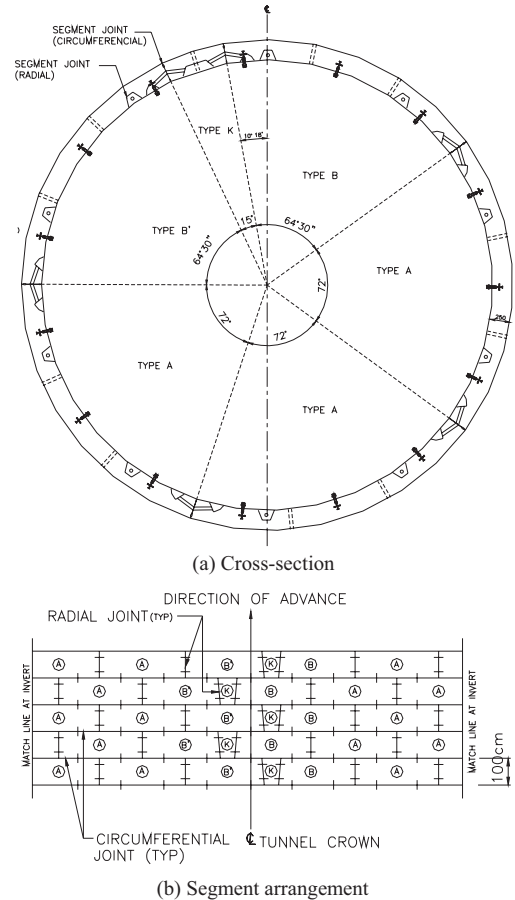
Typical layout of precast concrete lining segments for TRTS (after Kang *et al.* 2007).
